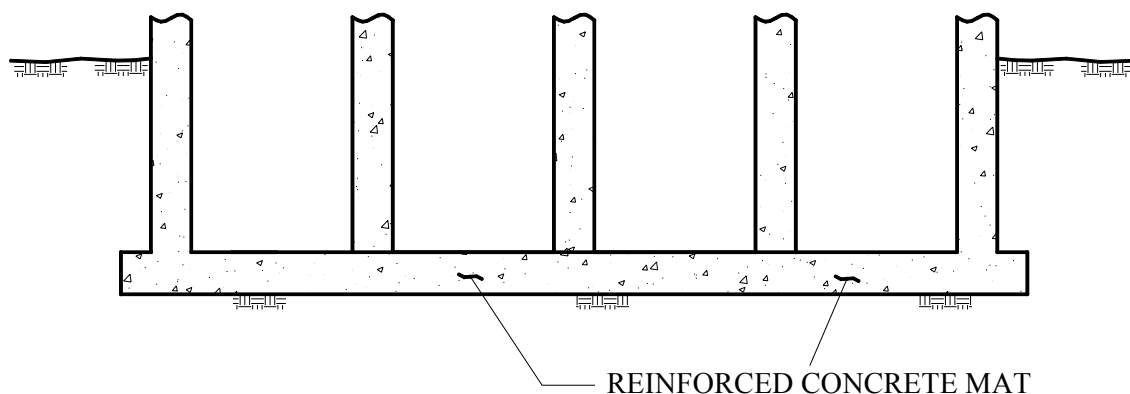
Typical mat foundation (FHWA, 2002c).
